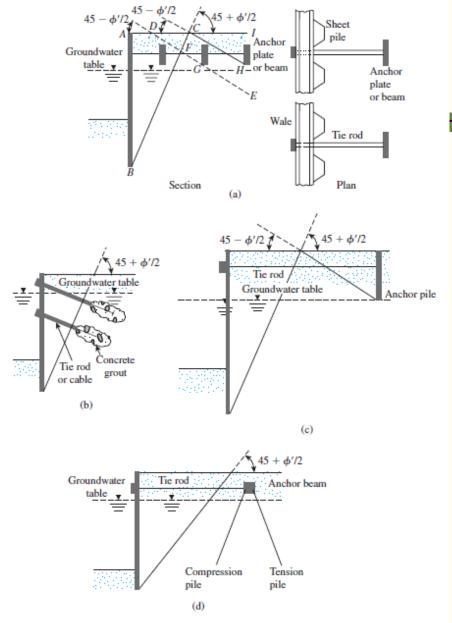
Various types of anchoring for sheet-pile walls: (a) anchor plate or beam; (b) tieback; (c) vertical anchor pile; (d) anchor beam with batter piles
